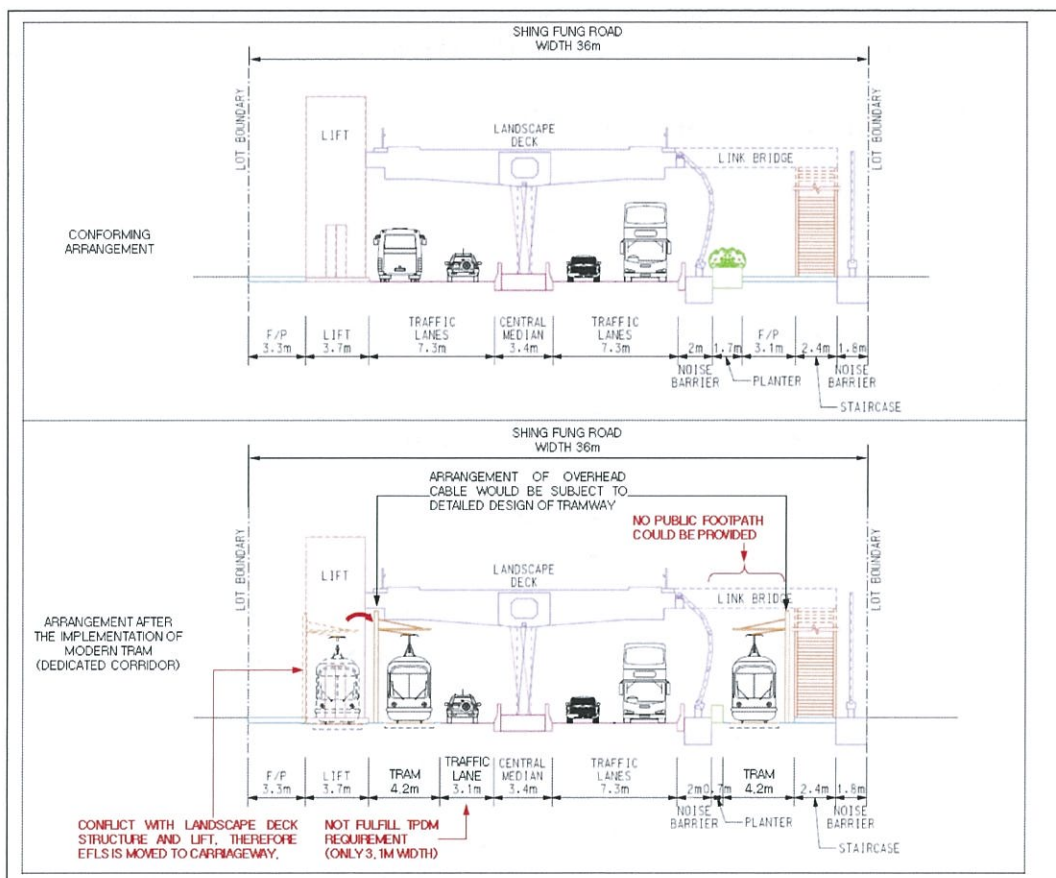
Typical Cross Section Plan of Option 4 – Shing Fung Road (Before and After Implementation)
